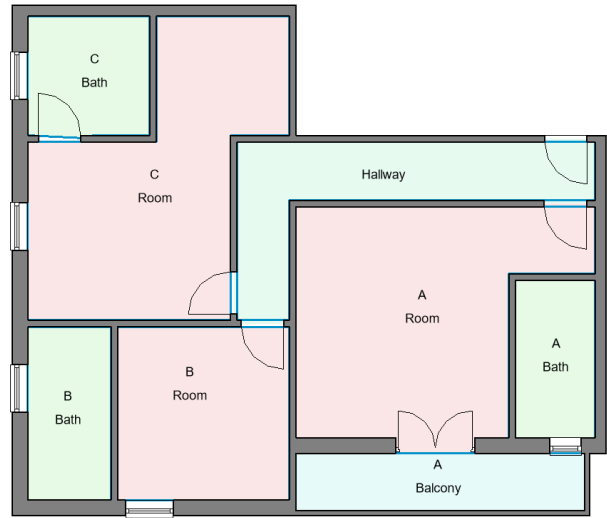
Plan of the apartment chosen as a study case, after the restructuring intervention.
